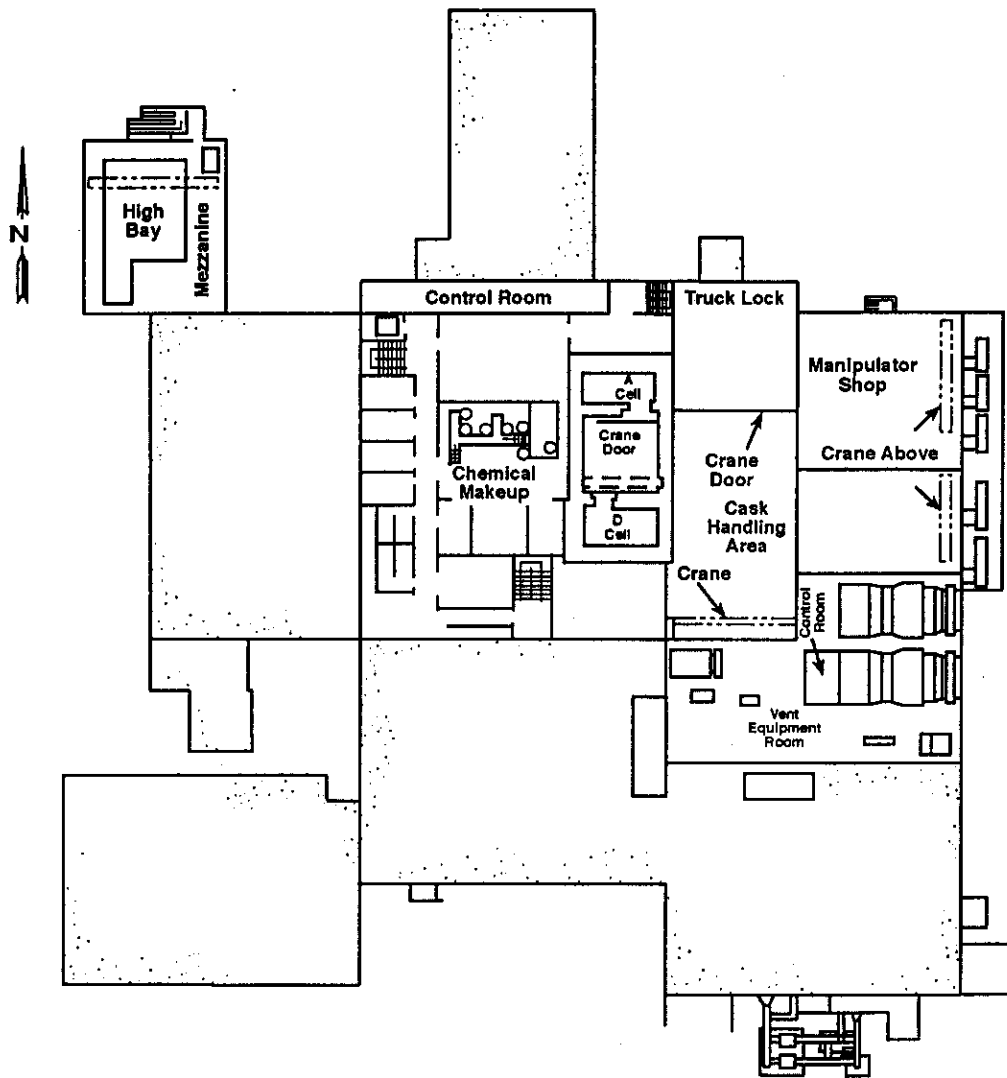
324 Building Floor Plans (2<sup>nd</sup> Floor).
